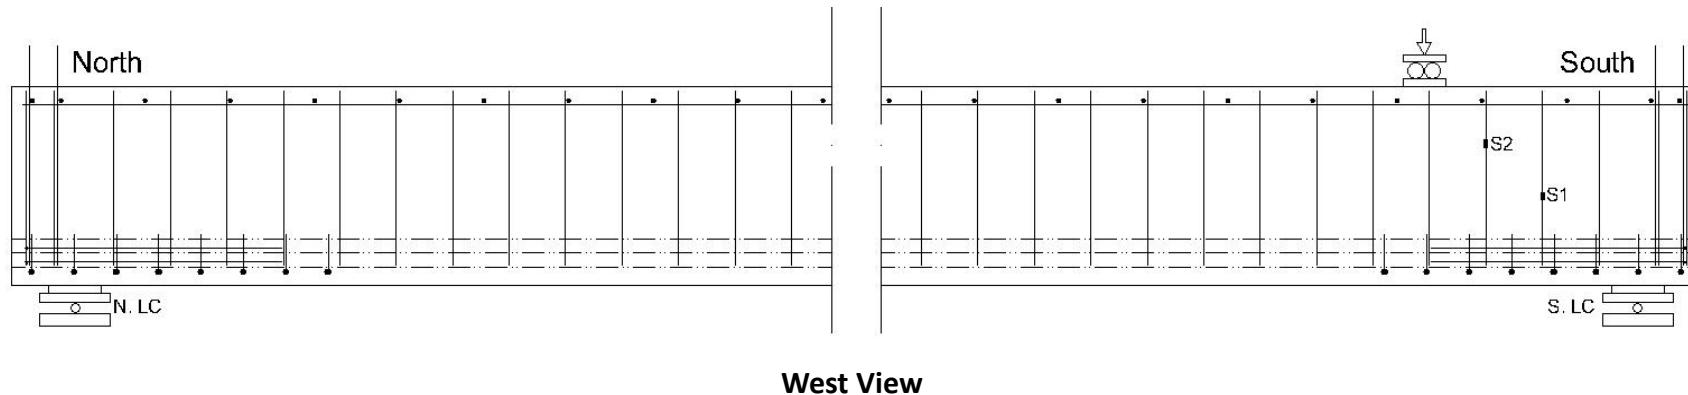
Layout of Strain Gauges on Transverse Reinforcement for Girder G2-South End Testing (Labib 2012)
